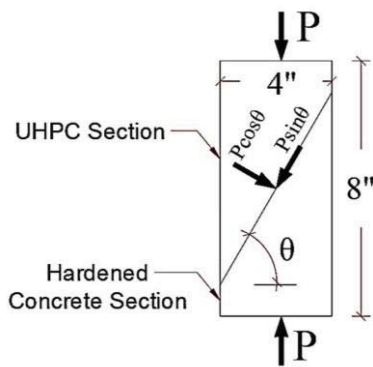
Slant Shear Test Specimen Dimensions and Test Setup.
